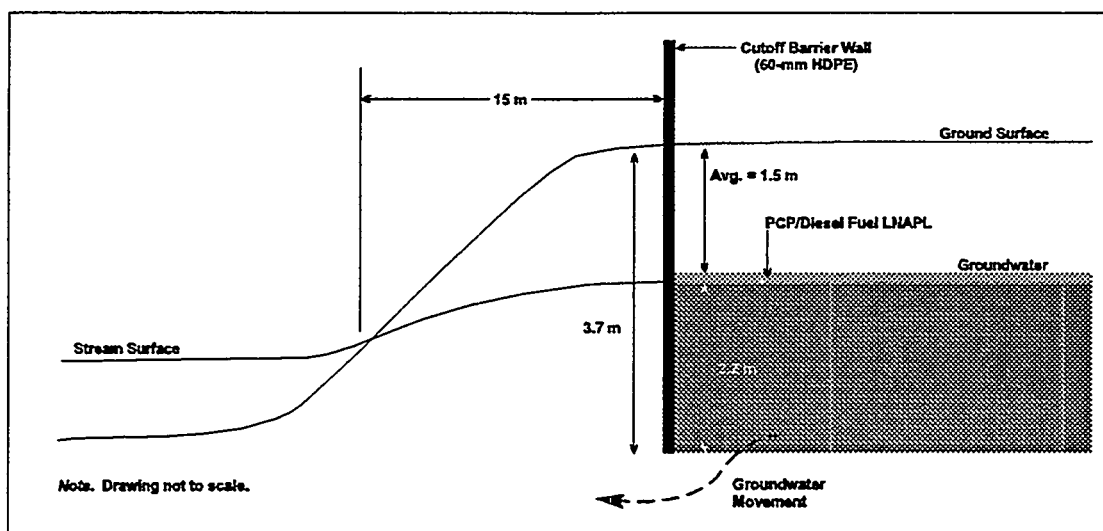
Cross-section sketch of the HDPE cutoff barrier wall.
